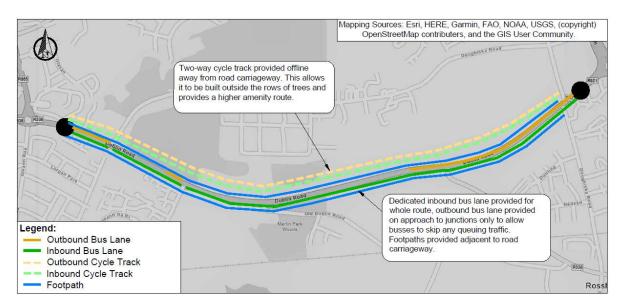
Section 2 Option 8 Indicative Scheme Design
